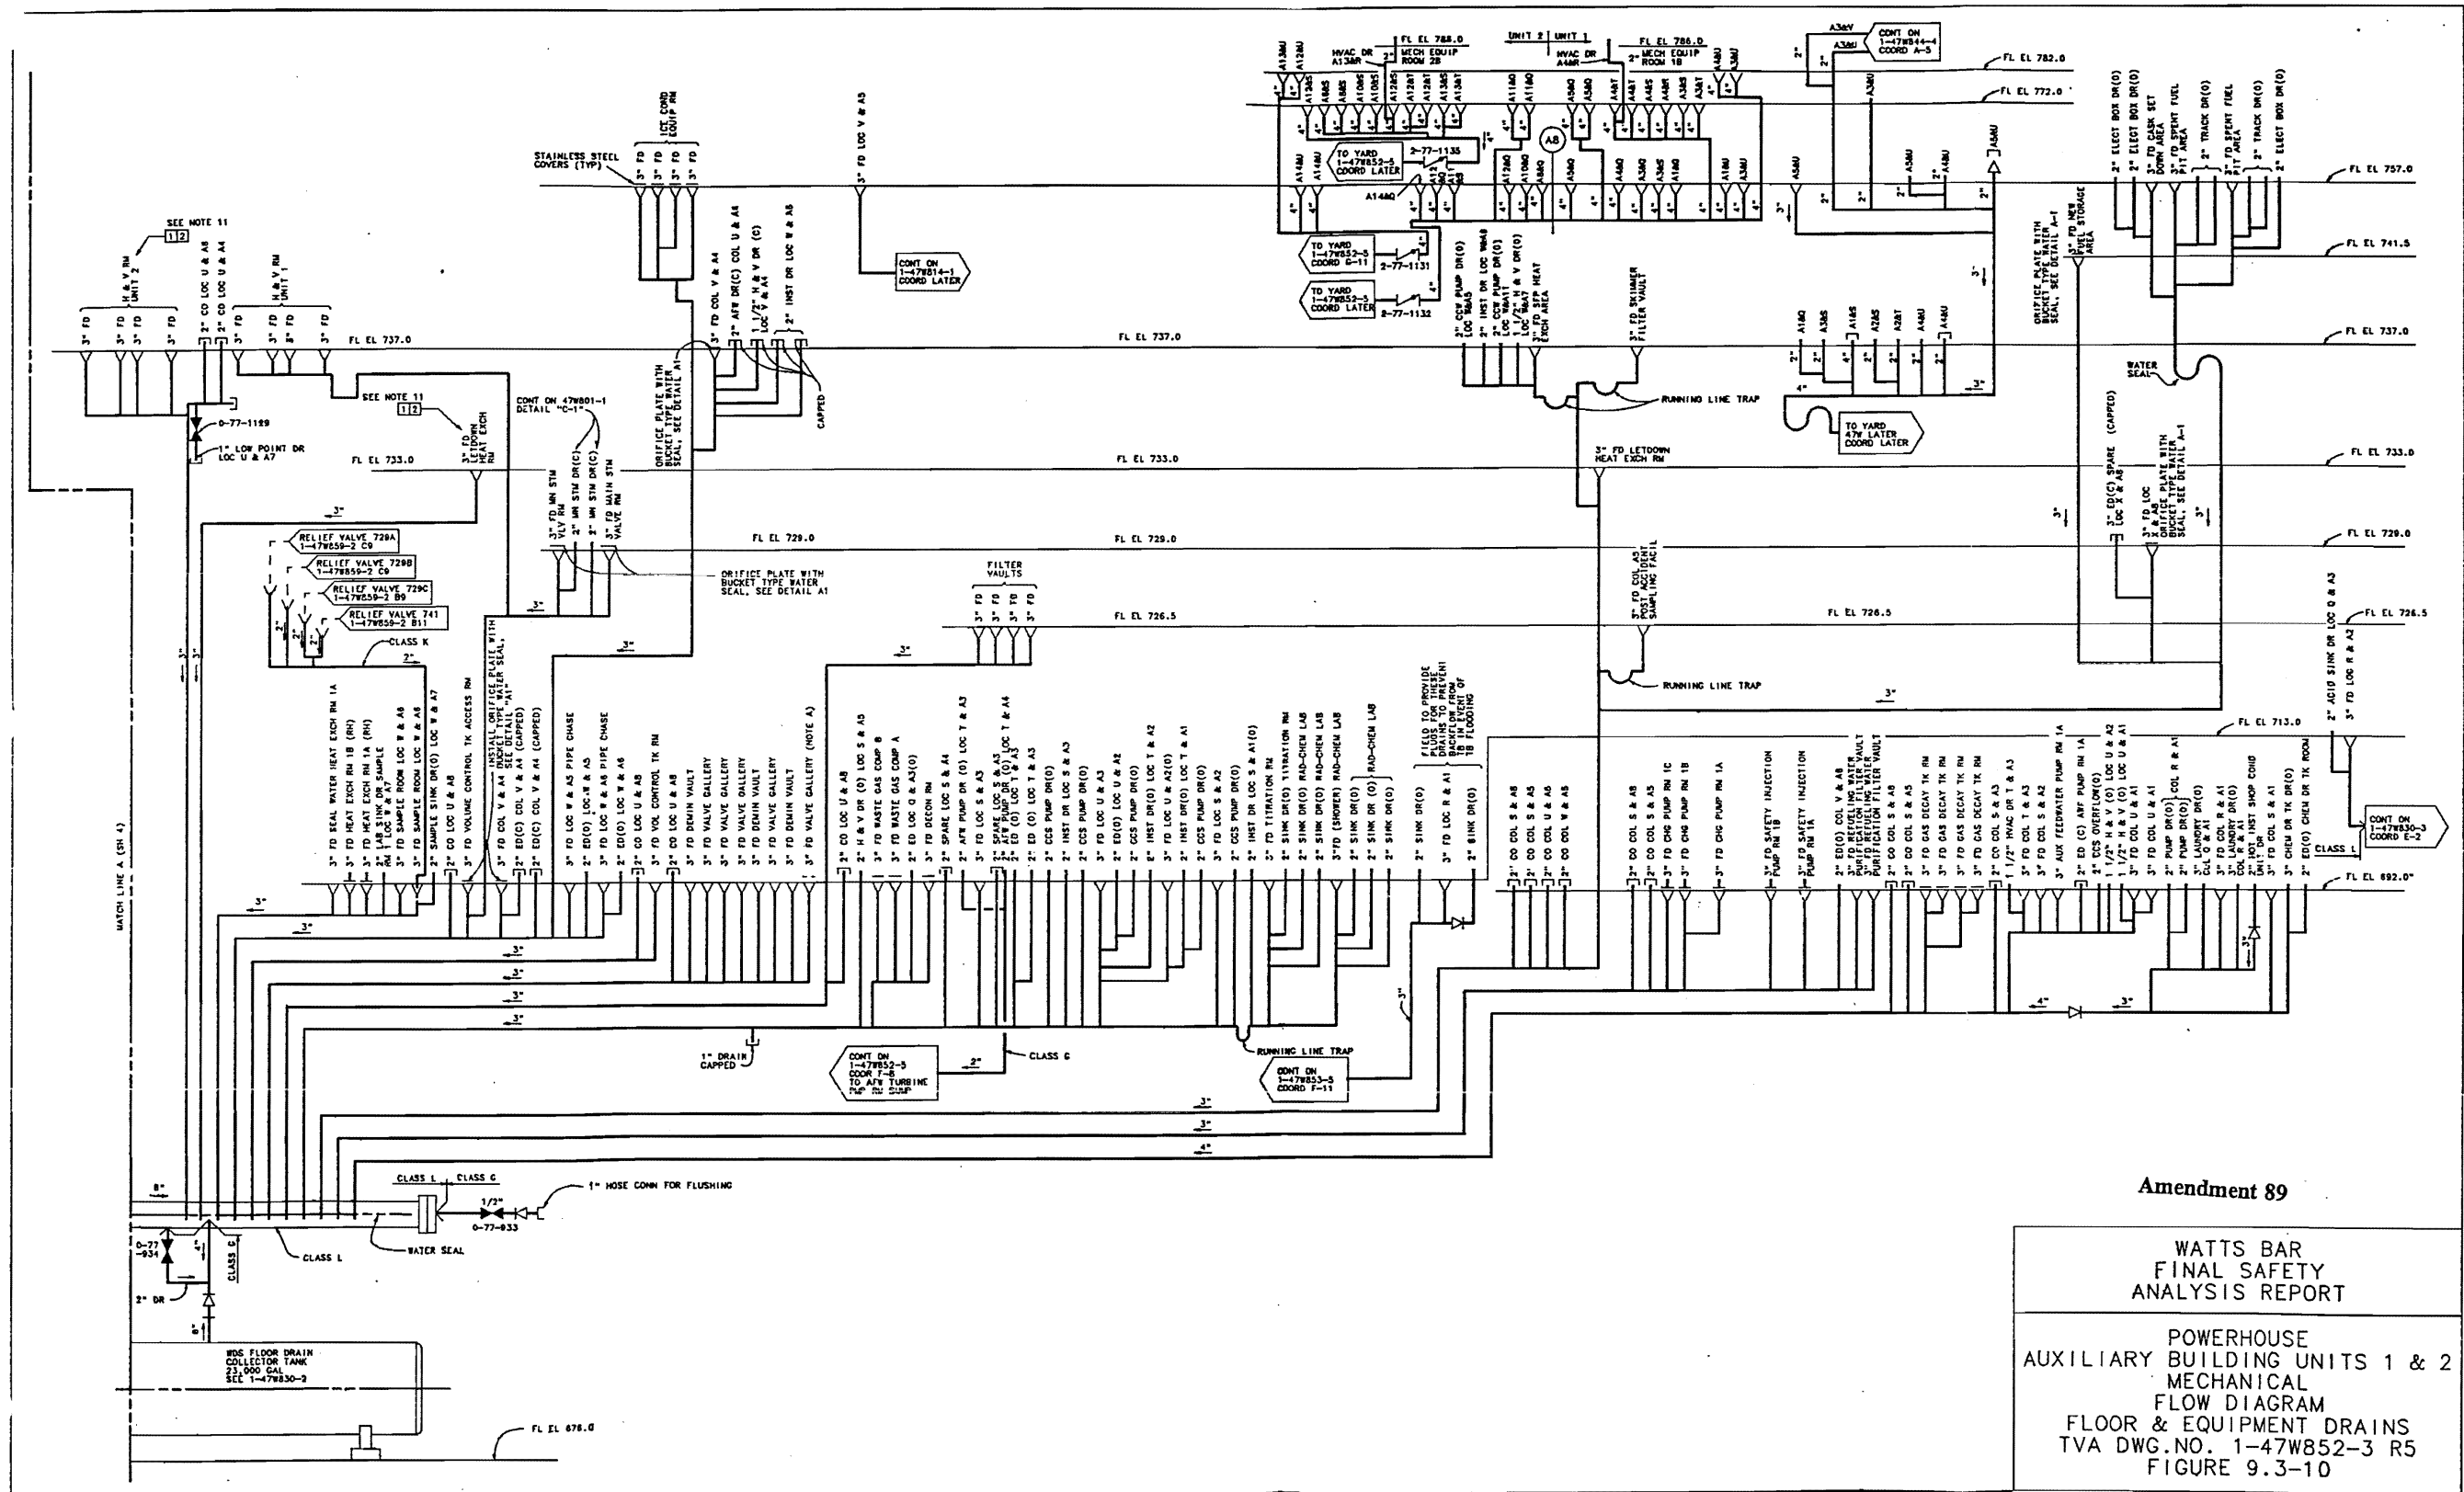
Powerhouse, Auxiliary Building Units 1 & 2 Flow Diagram - Floor and Equipment Drains
